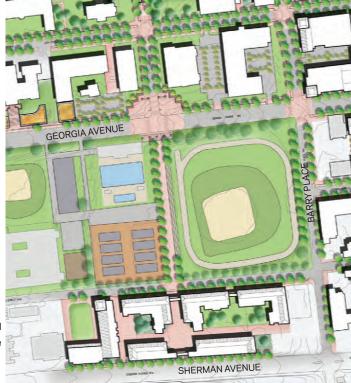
Opposite: Plan view of proposed Gateway at Howard Place and Georgia Avenue
